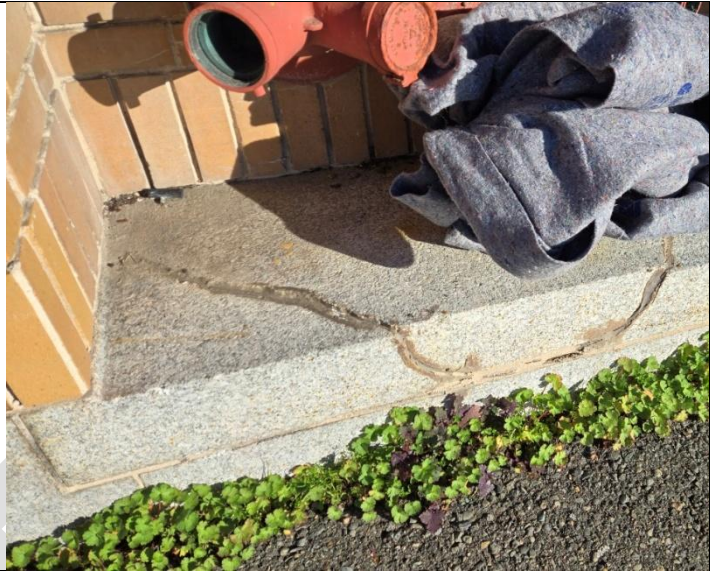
Cracking through granite at base of wall, previously sealed/epoxied
